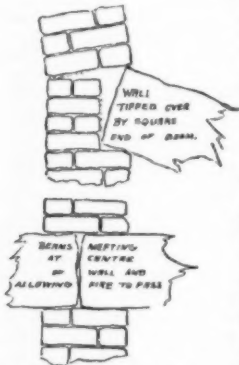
BAD METHODS OF RESTING BEAMS ON WALLS.
